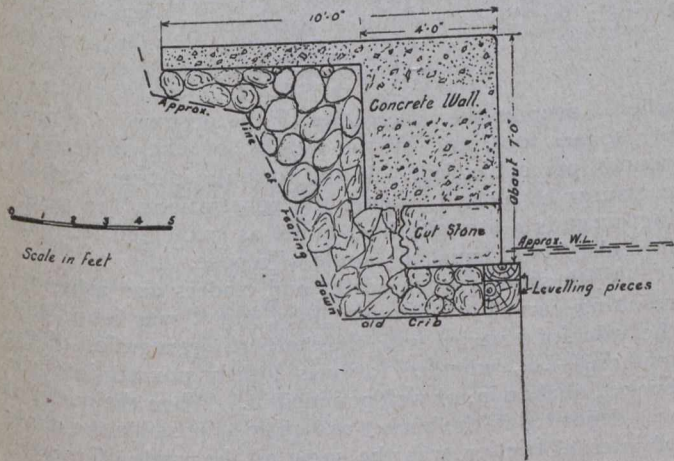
Section of Concrete Wall and Slab on Crib.
